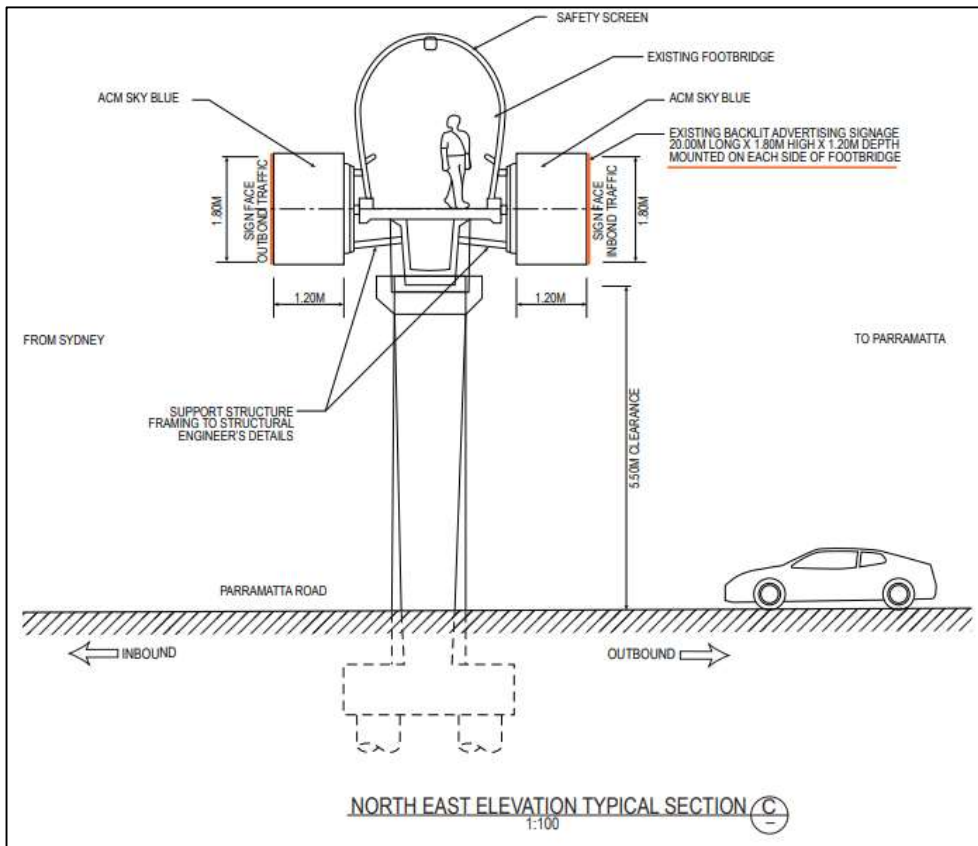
| Cross section of the structures (source: revised architectural drawings 27/5/24)
